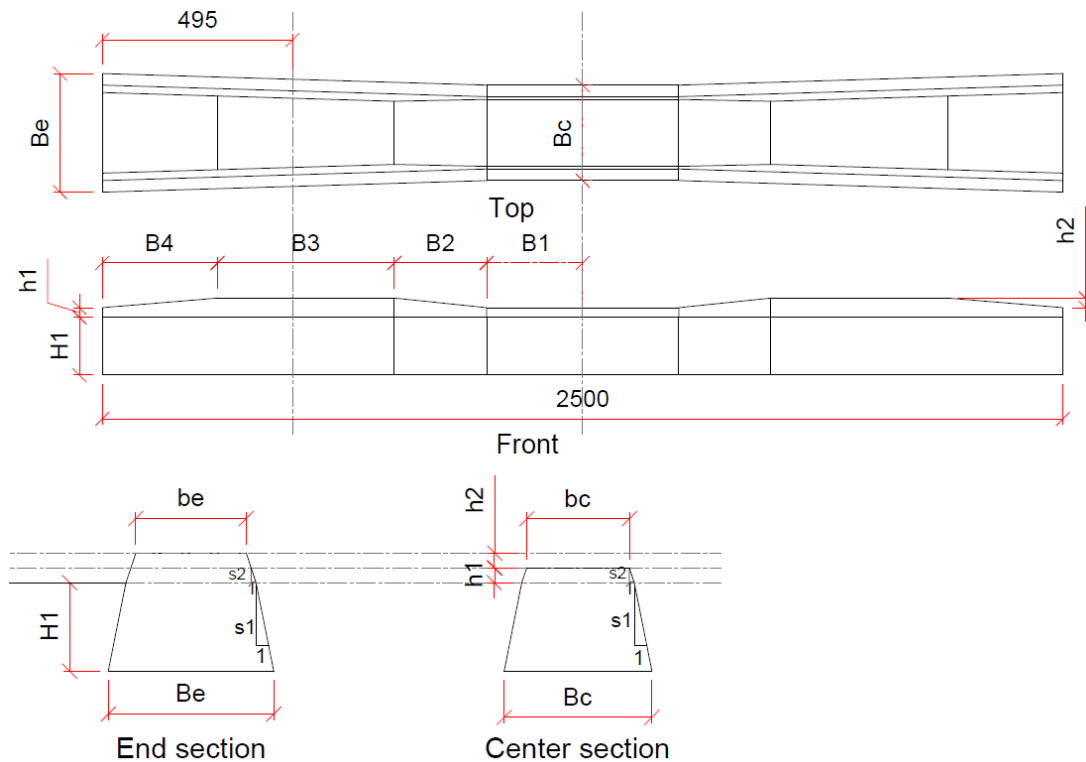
Trapezoid sleeper sections with different width at rail seat and center sections
